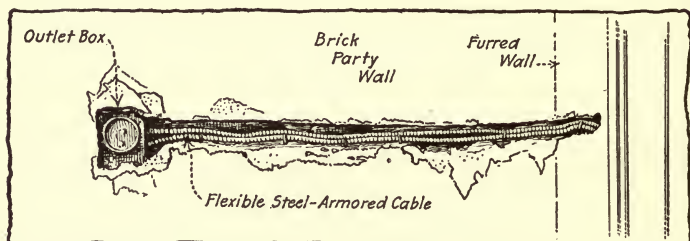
Conductors and bracket outlet in brick, party wall in front parlor.
